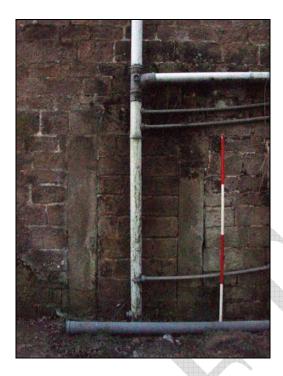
Photograph of the original back door on the north-east façade of the house (facing south-west) (scale = 2m).
